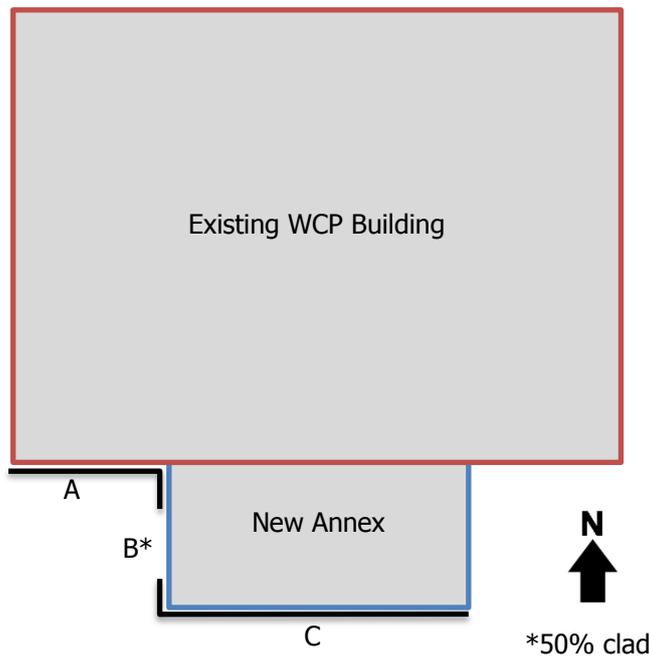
Schematic plan of WCP annex extension and proposed cladding on Level 1
